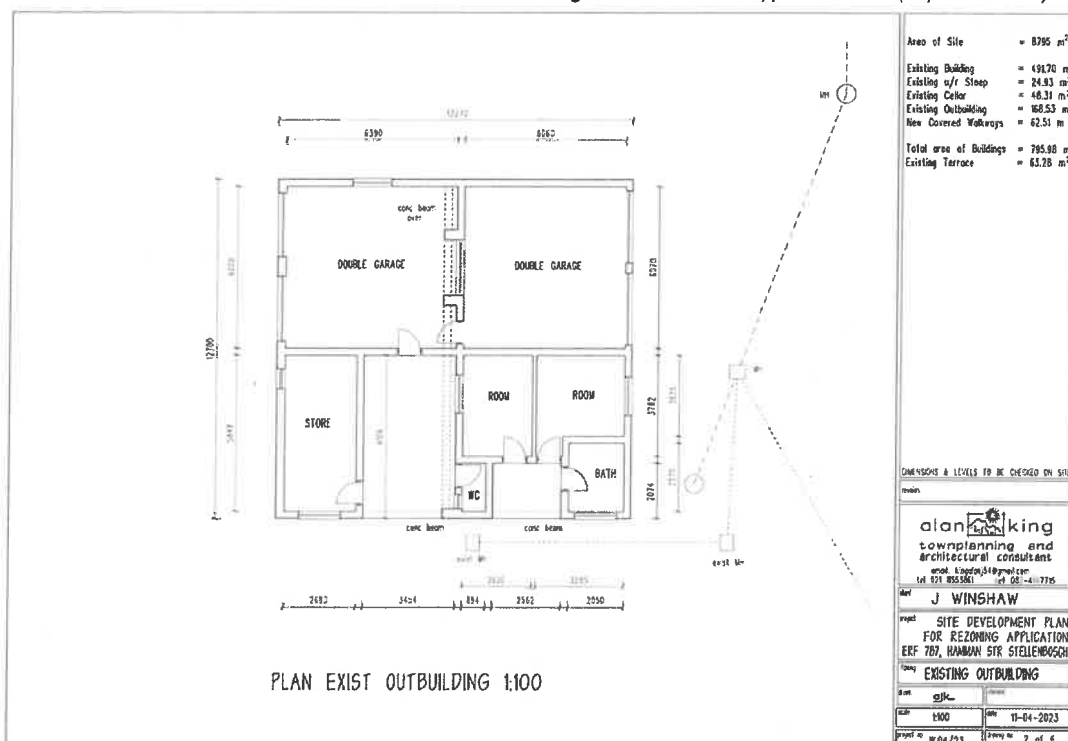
Floor Plan of Existing Outbuilding (September 2017)
